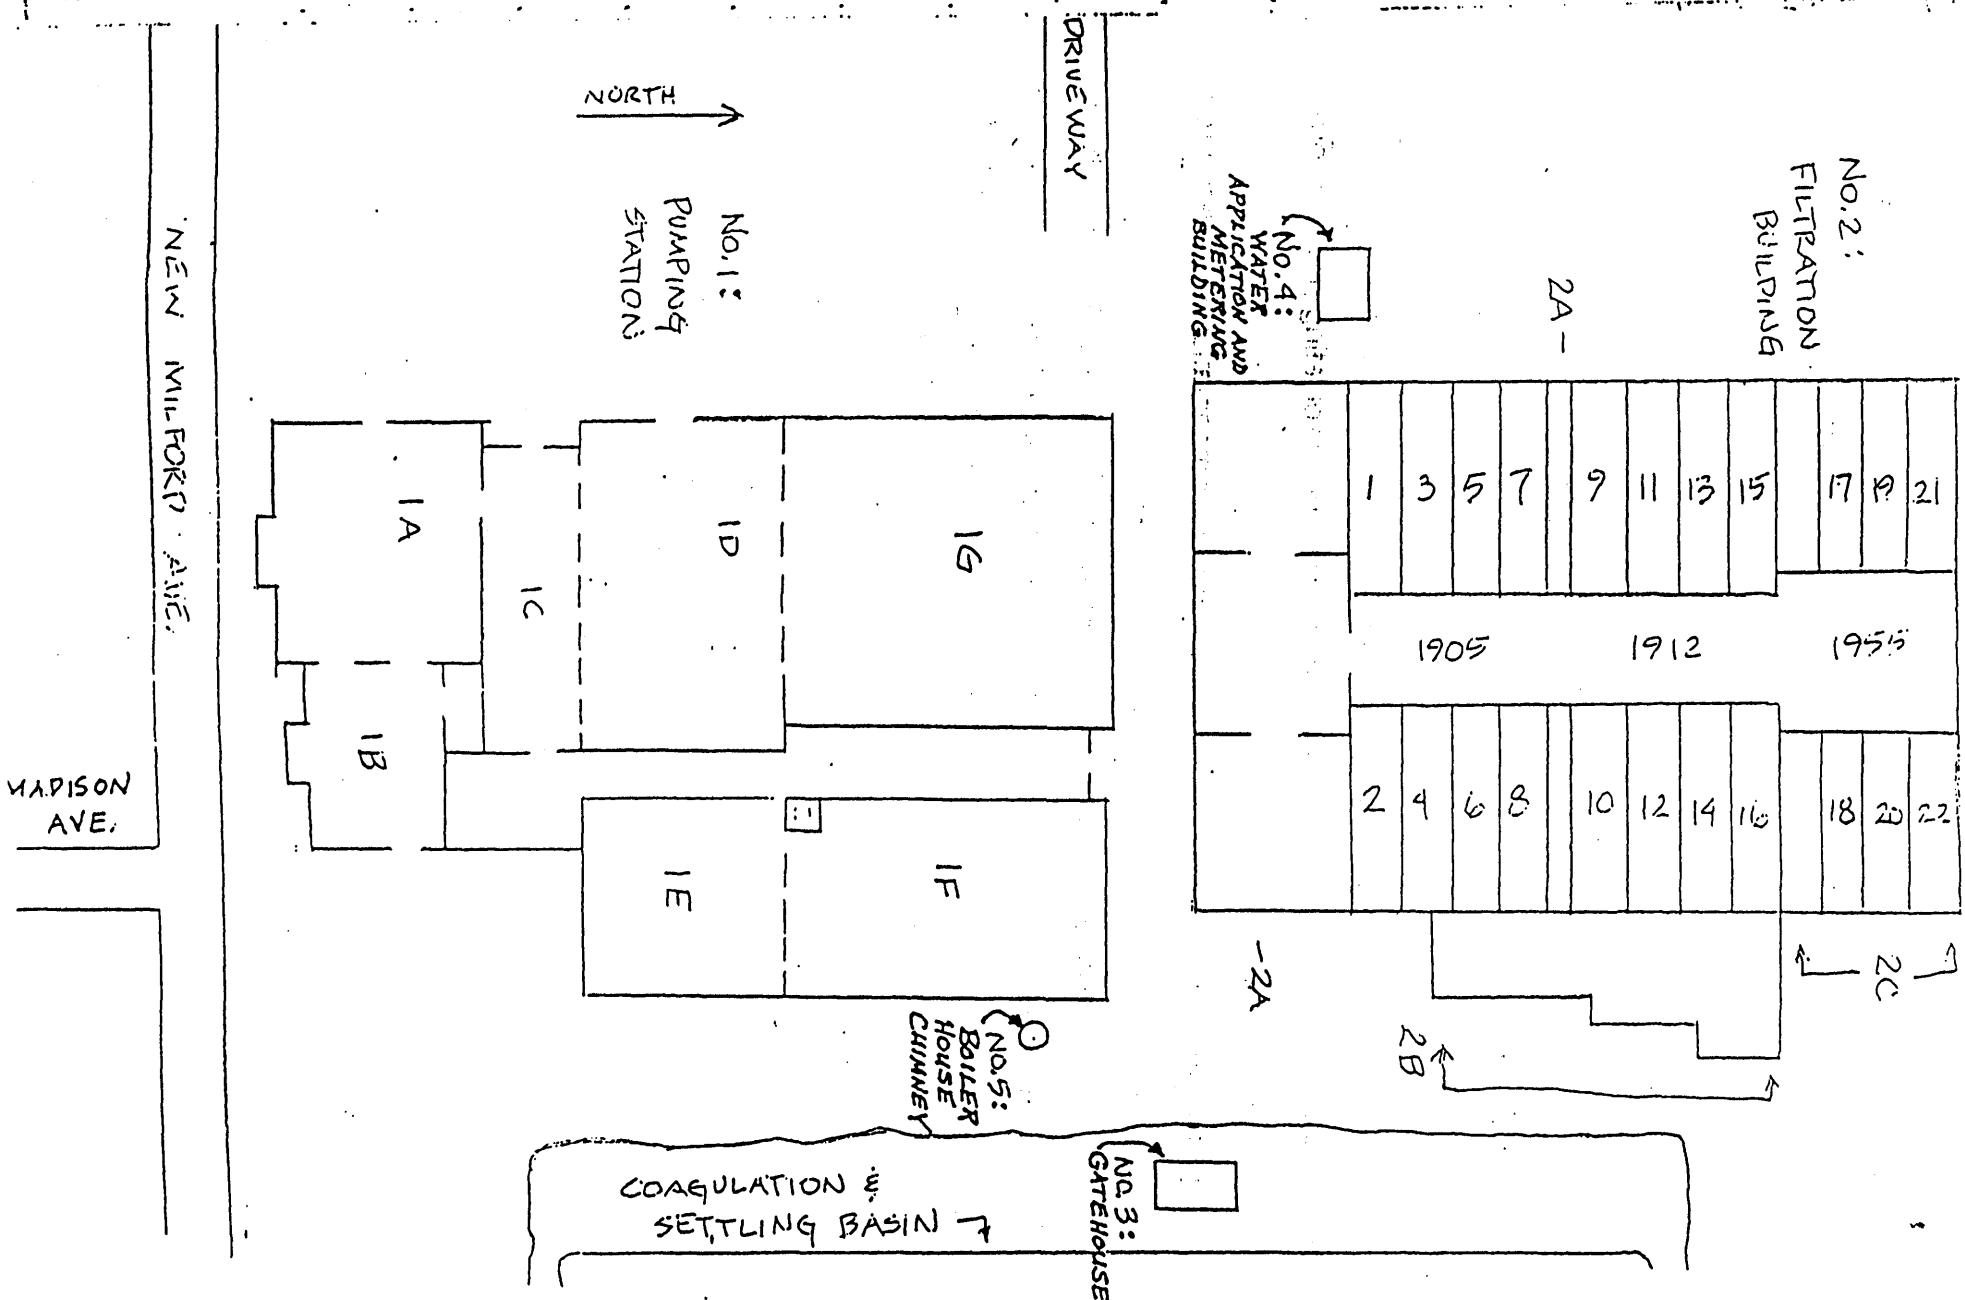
Hackensack Water Company New Milford Plant, Oradell, N.J. Site Plan for Historical Review and Evaluation. Not to scale. Locations are approximate. Most exterior fenestration and all interior walls are not detailed. August 1991. Elise Baranowski.
